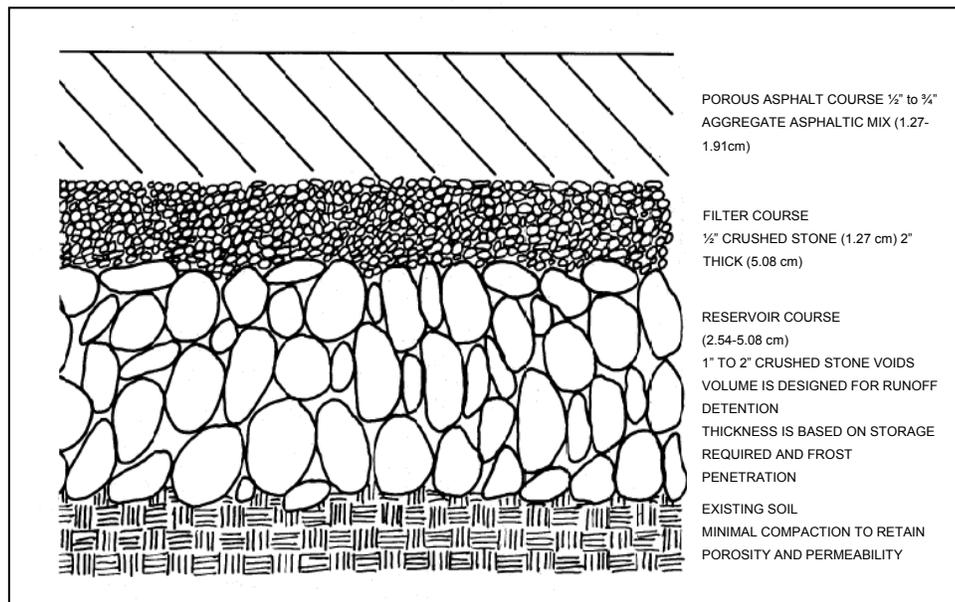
Porous Asphalt Paving Typical Section [Diniz 1980]
